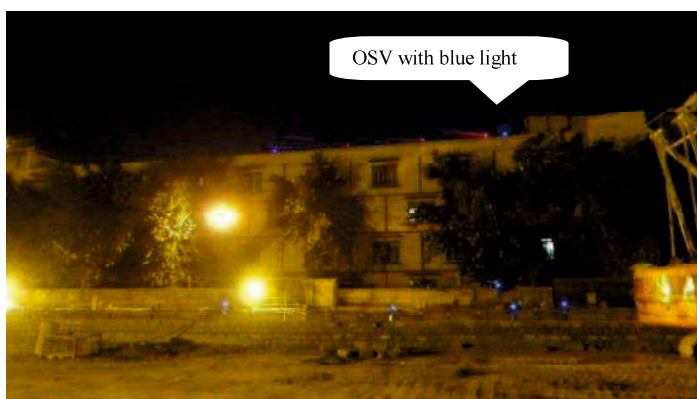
OSV monitoring at the construction site of the Delhi Metro Project¹
